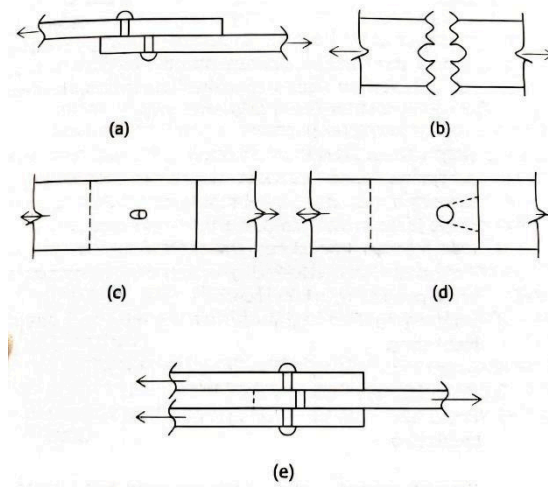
Type of Plate Connection Failure (Pertwi et al., 2023)
